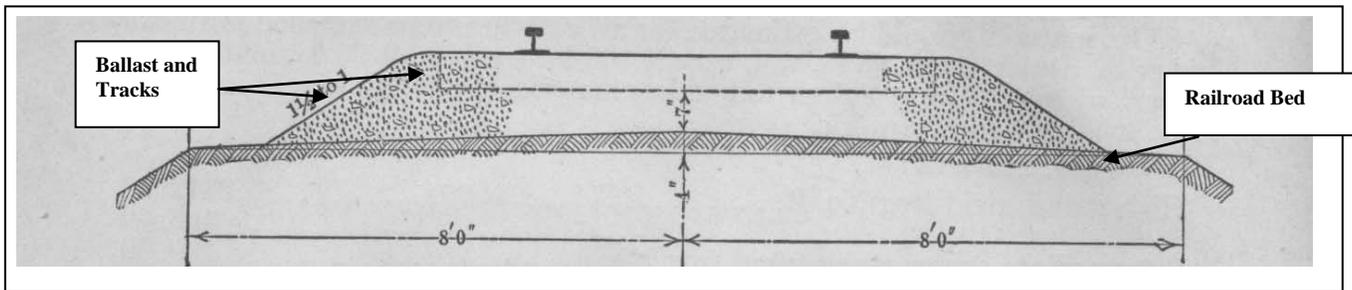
Typical railroad bed, ballast, and tracks (Orrock 1918:14)
